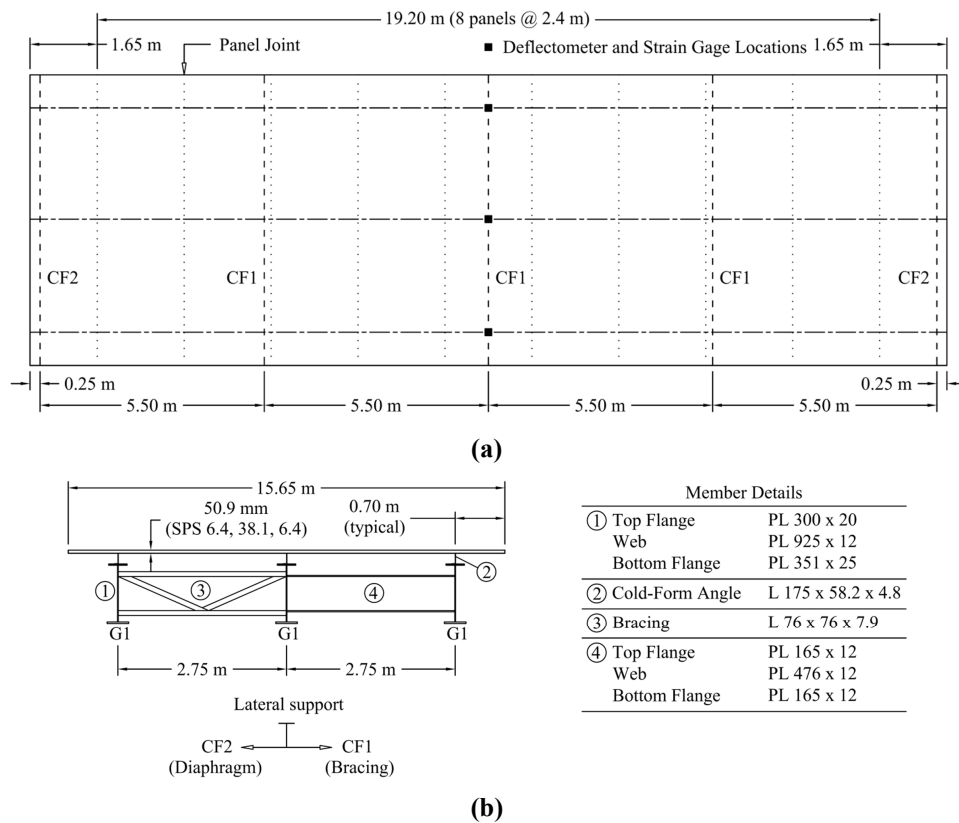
Shenley Bridge: (a) plan diagram, (b) cross-section diagram
